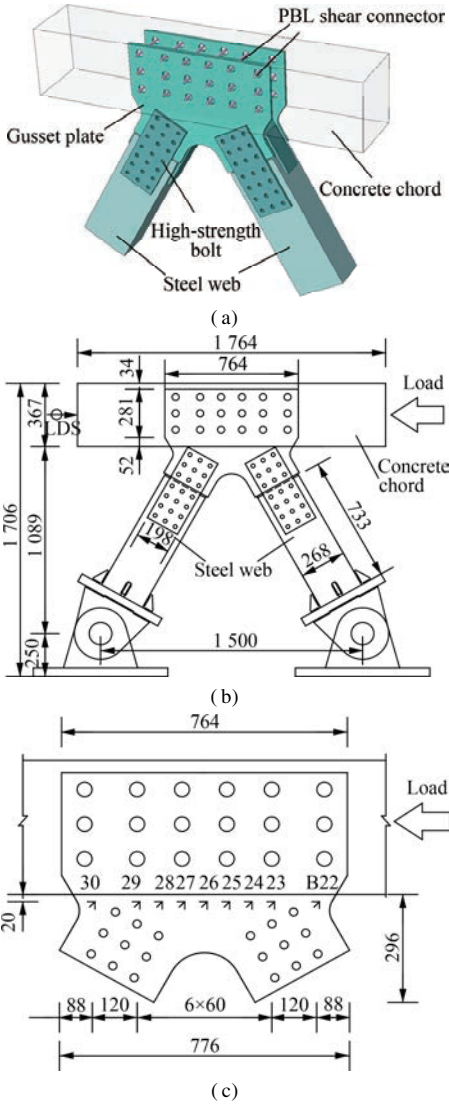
Composite external joint models (unit: mm). (a) Schematic of external joint; (b) Overall dimensions; (c) Gusset plate dimensions
